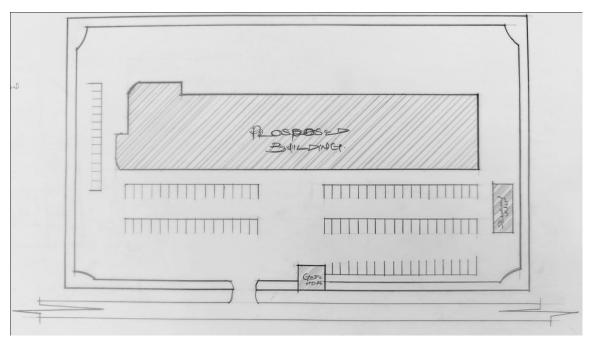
SITE PLAN OF CASE STUDY ONE
